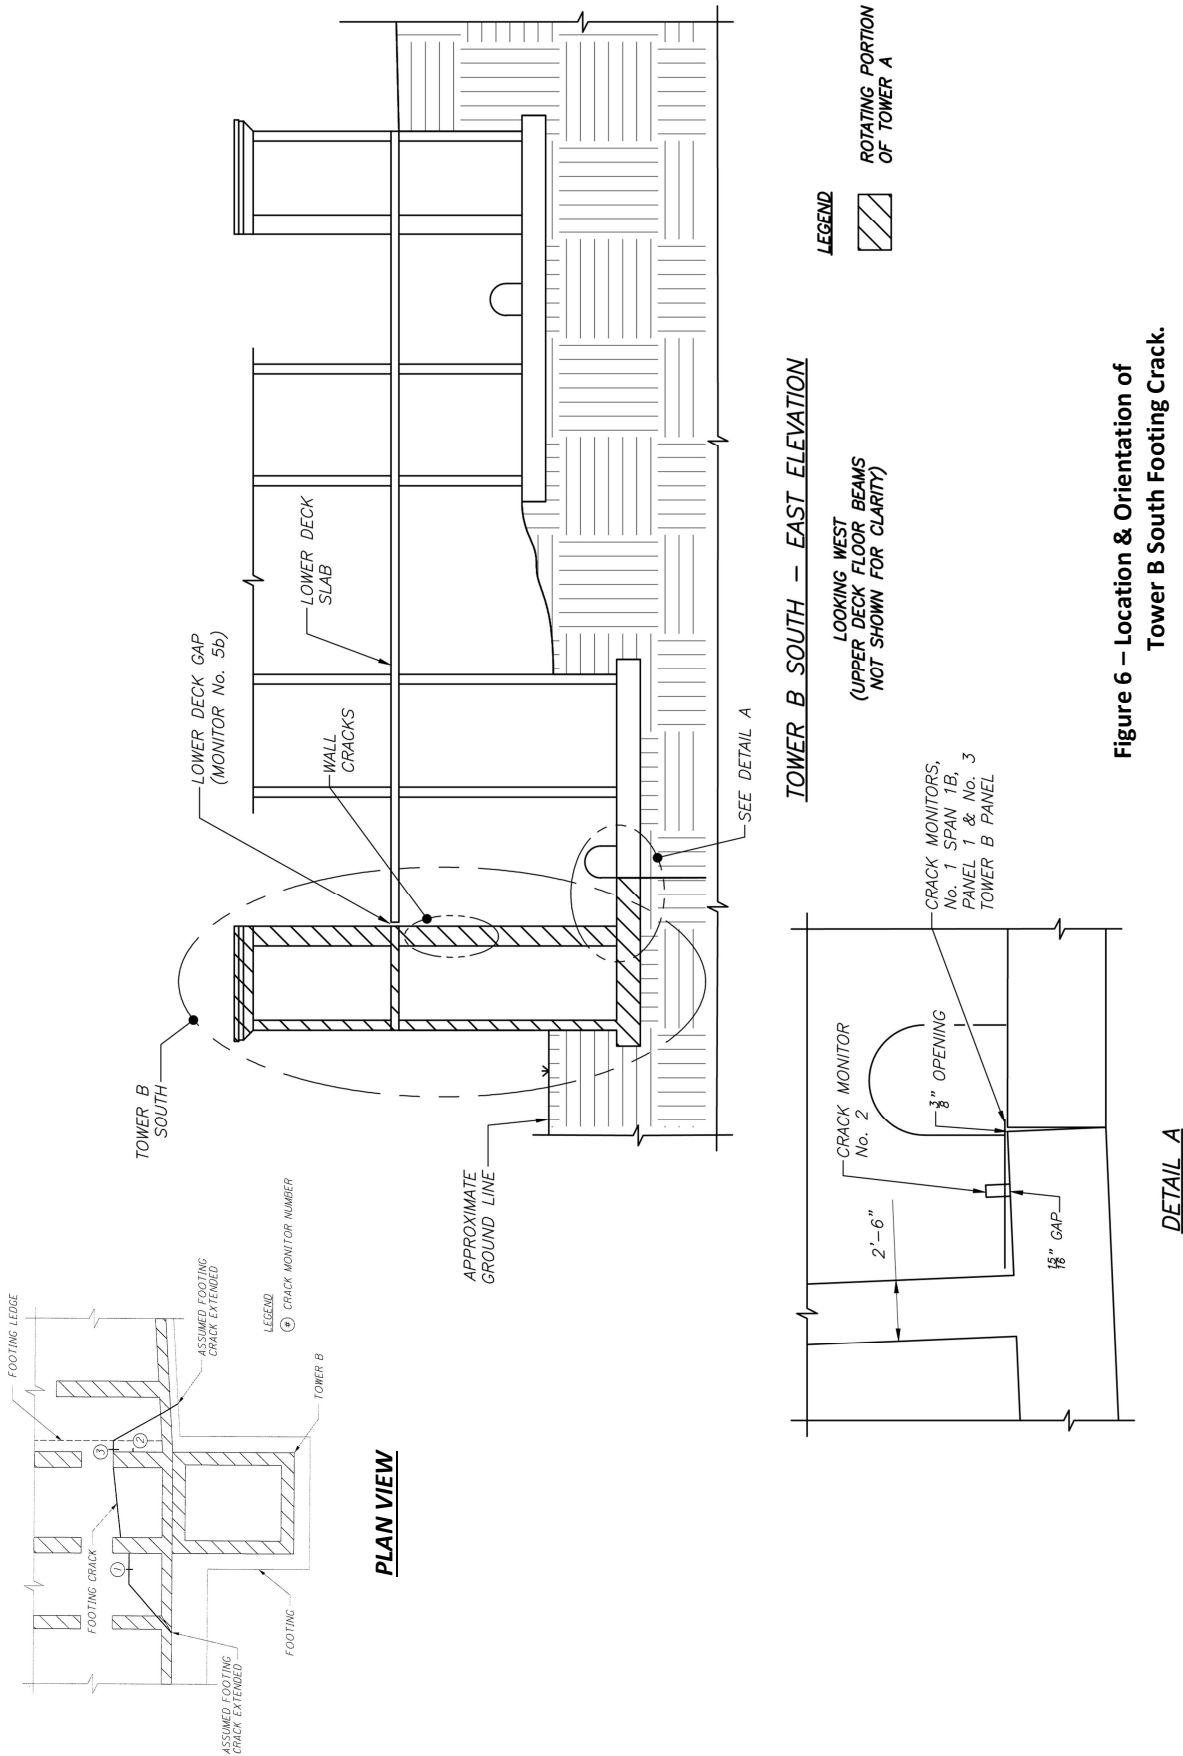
Location & Orientation of Tower B South Footing Crack.
